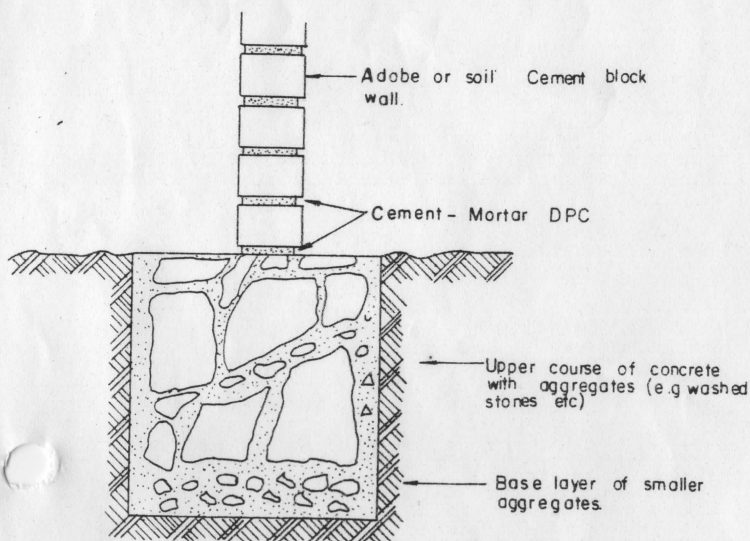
A Cyclopean concrete foundation (after ref 9)
